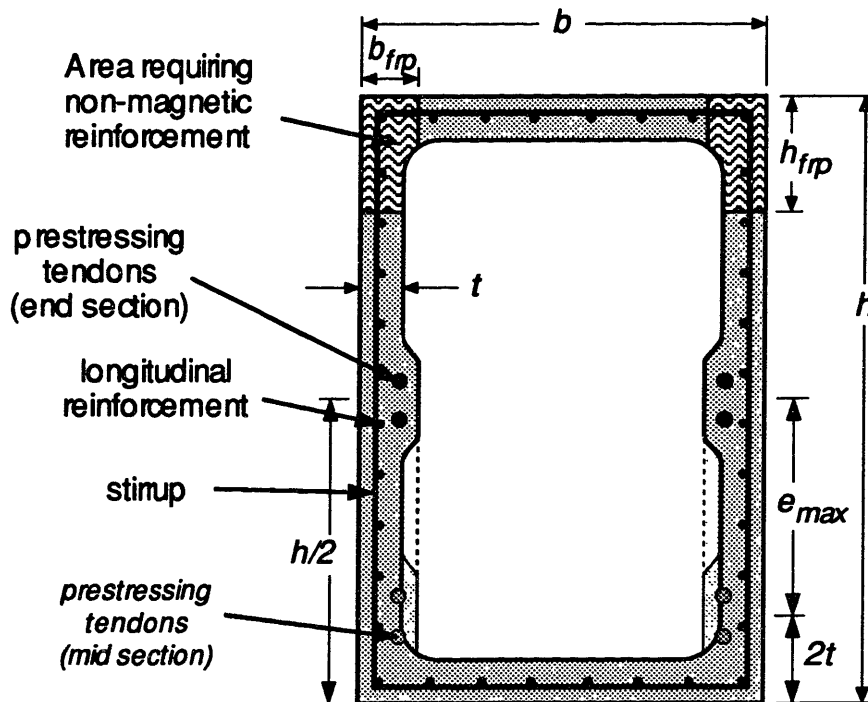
Narrow Beam Guideway Cross-Section (end section)
